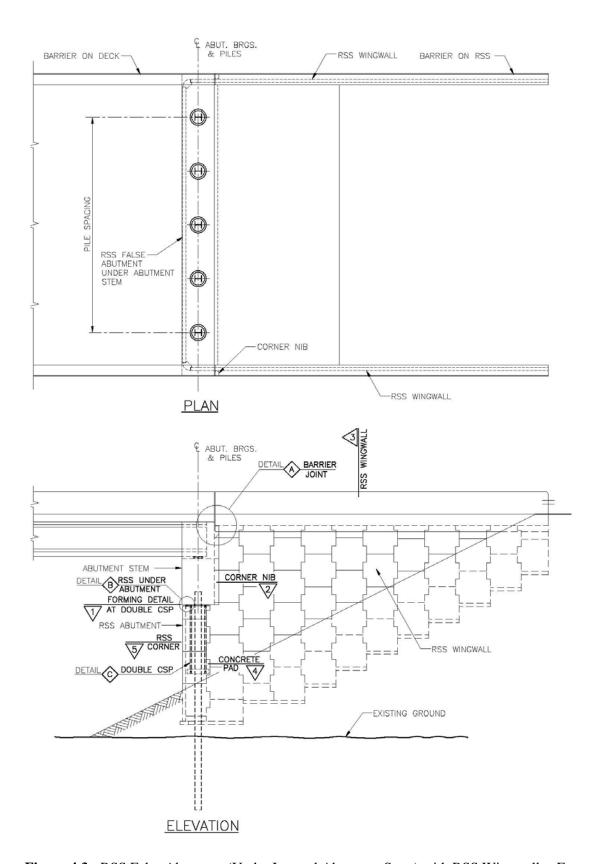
RSS False Abutment (Under Integral Abutment Stem) with RSS Wingwalls. For Section 1, 2, 3, 4 and 5 see Figures 5.6, 5.11, 5.1, 5.7 and 5.15 respectively. For Detail A, B and C see Figure 5.14, 5.8 and 5.4 respectively.
